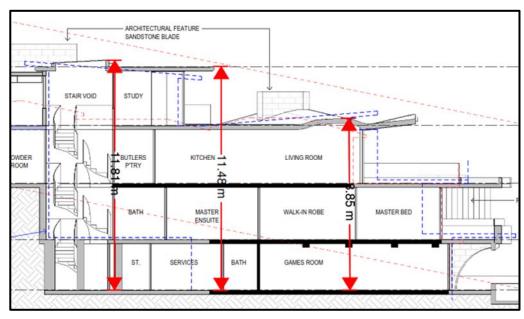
Extract Section plan (Dwg DA-301/P4) of the development with measurements to existing ground levels (ie RL 3.8m AHD of lower ground floor)
